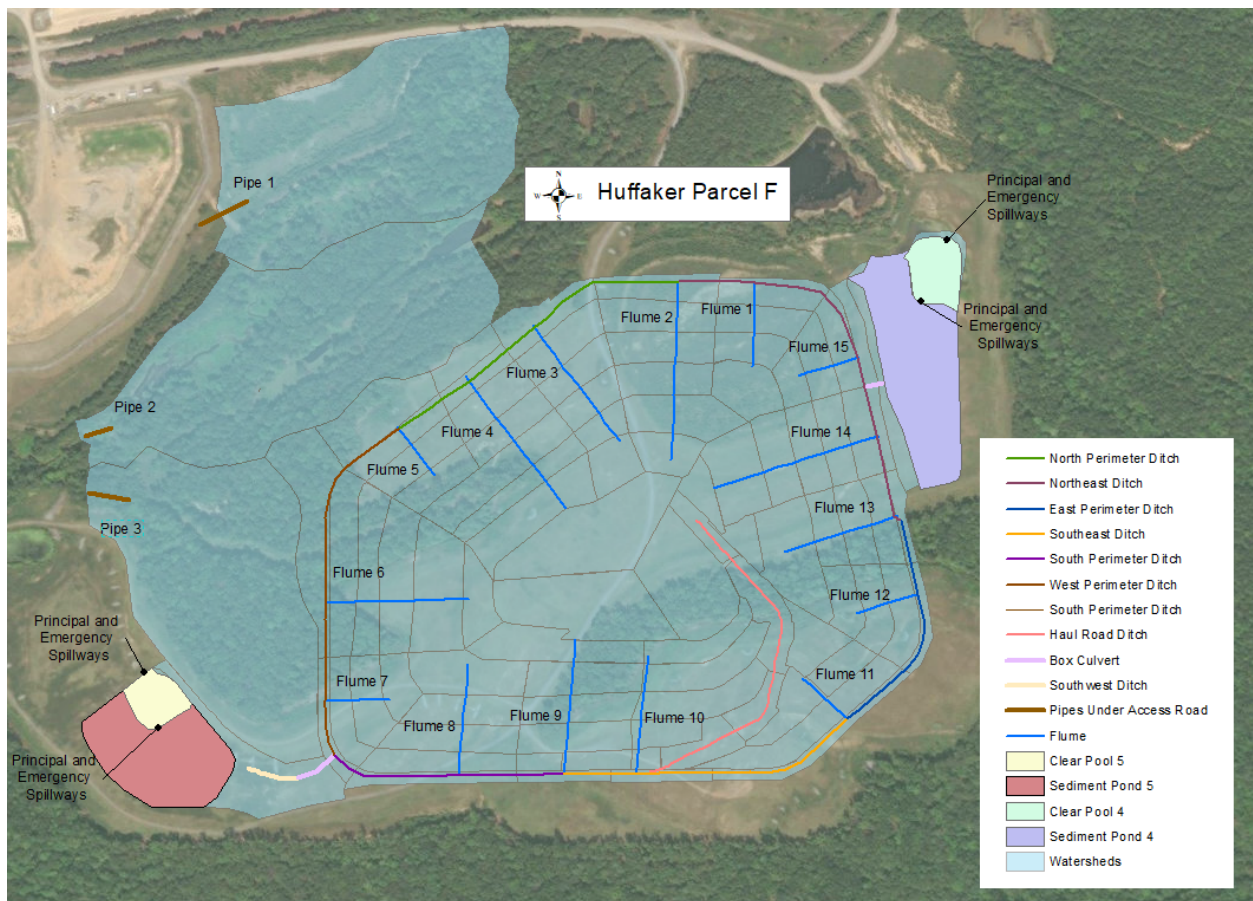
Huffaker Road Landfill – Parcel F Proposed Stormwater Structures
